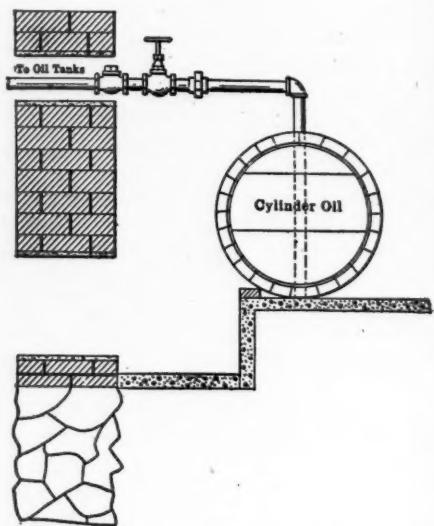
BARRELS EMPTIED OUTSIDE THE BUILDING
